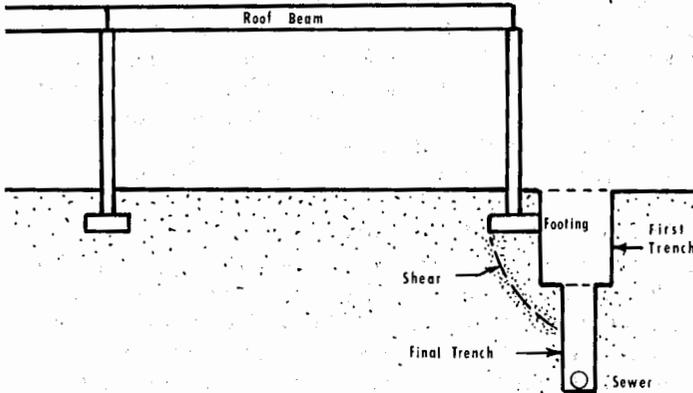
Cross section of sewer trench which undermined a footing and caused a “row of dominos” collapse of 50,000 sq ft of building
